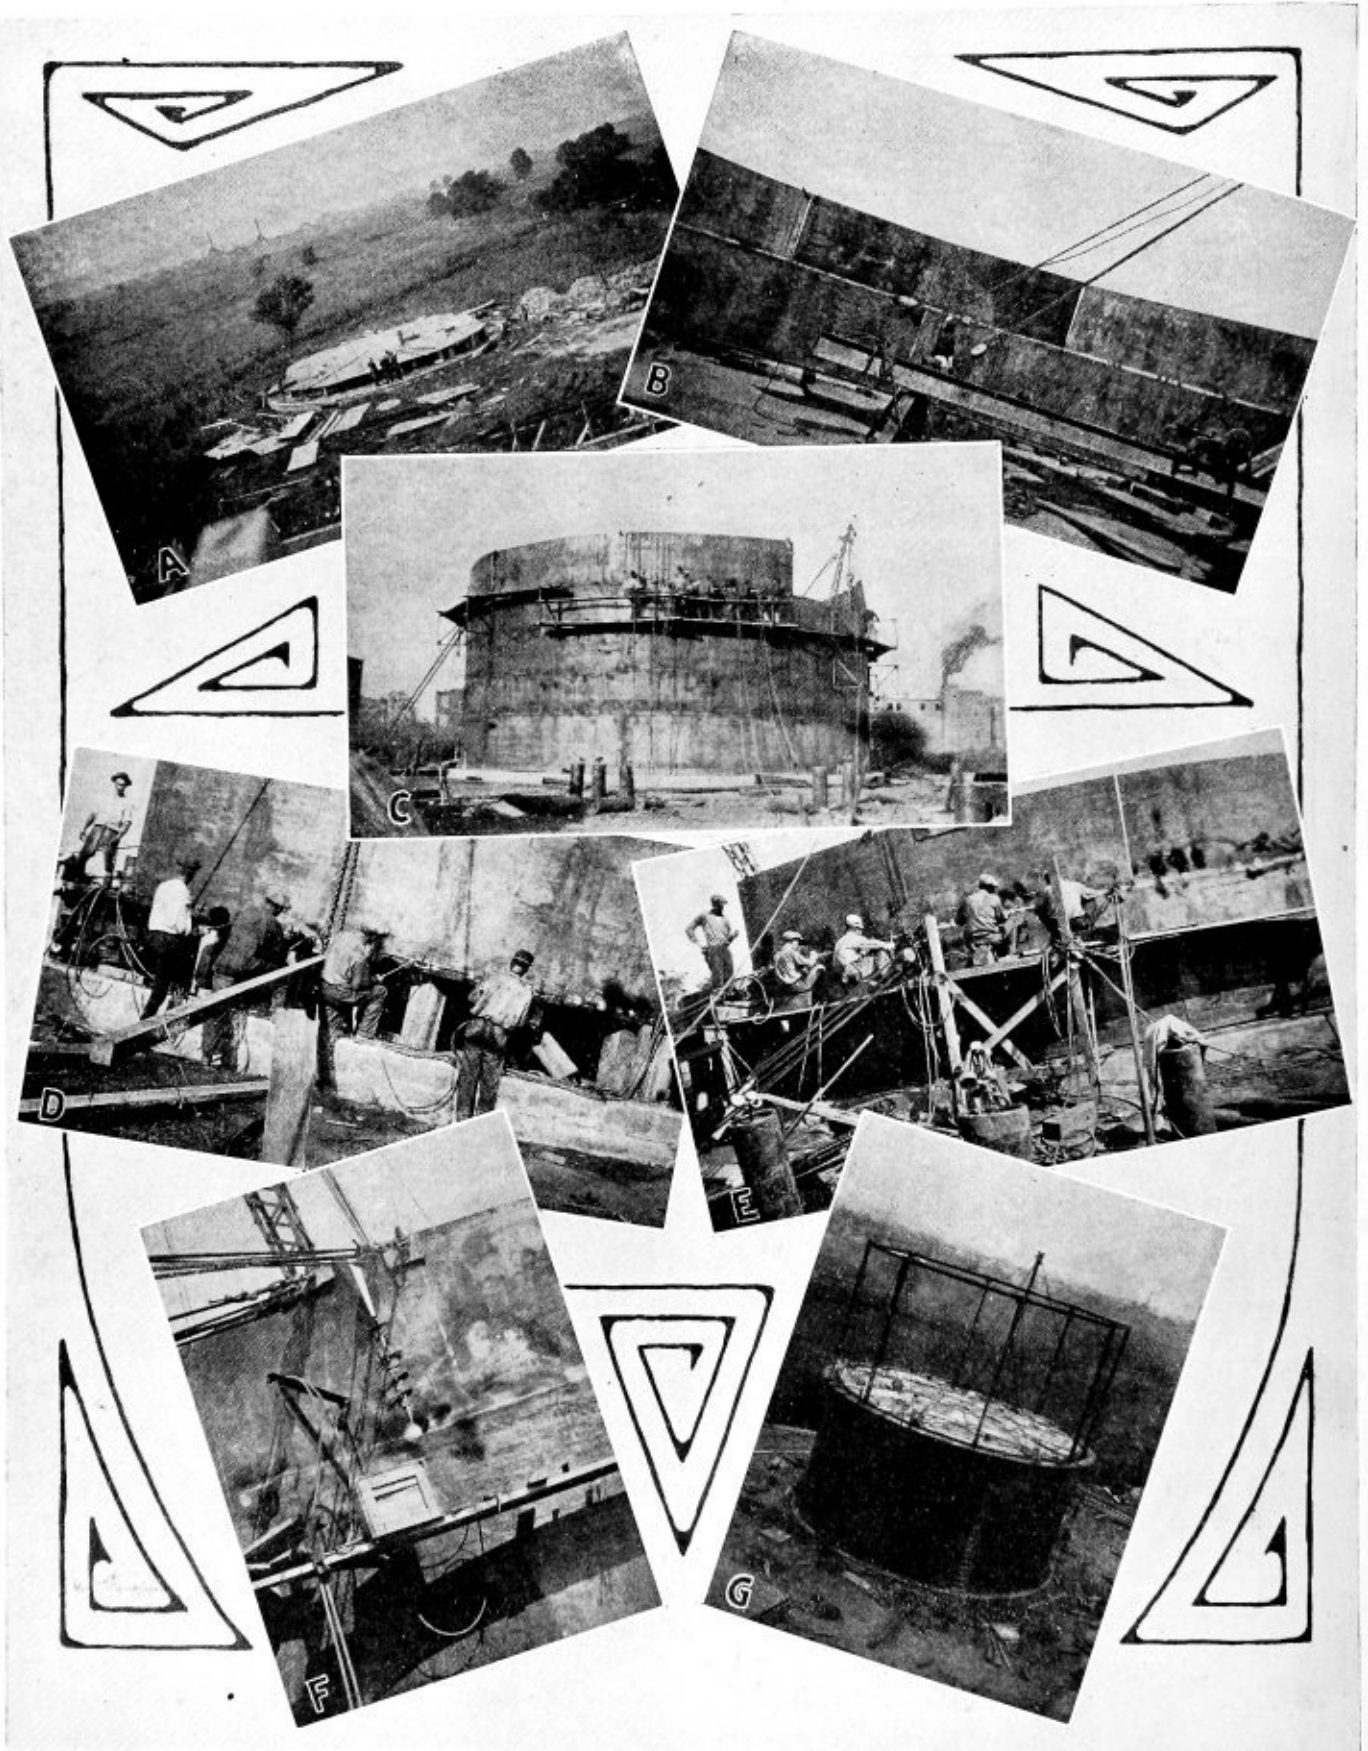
(A) Bottom Plates Ready for Welding. (B) Second Ring "Key" Plate Clamped in Position. (C) Welding One of the Upper Rings. (D) Welding the First Course. (E) At Work on the Second Ring. (F) Method of Controlling Expansion and Contraction in Plates. (G) All Welded Gasholder Completed.
